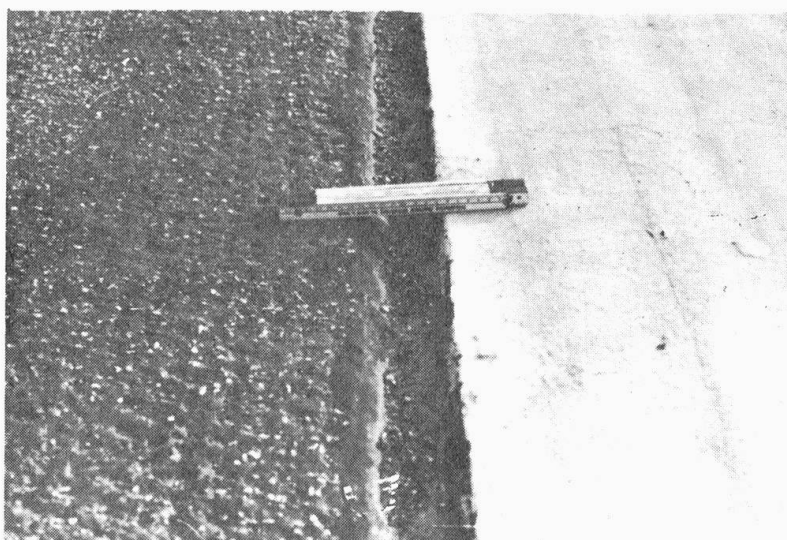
Enlarged joint (8 cm) at longitudinal connection
